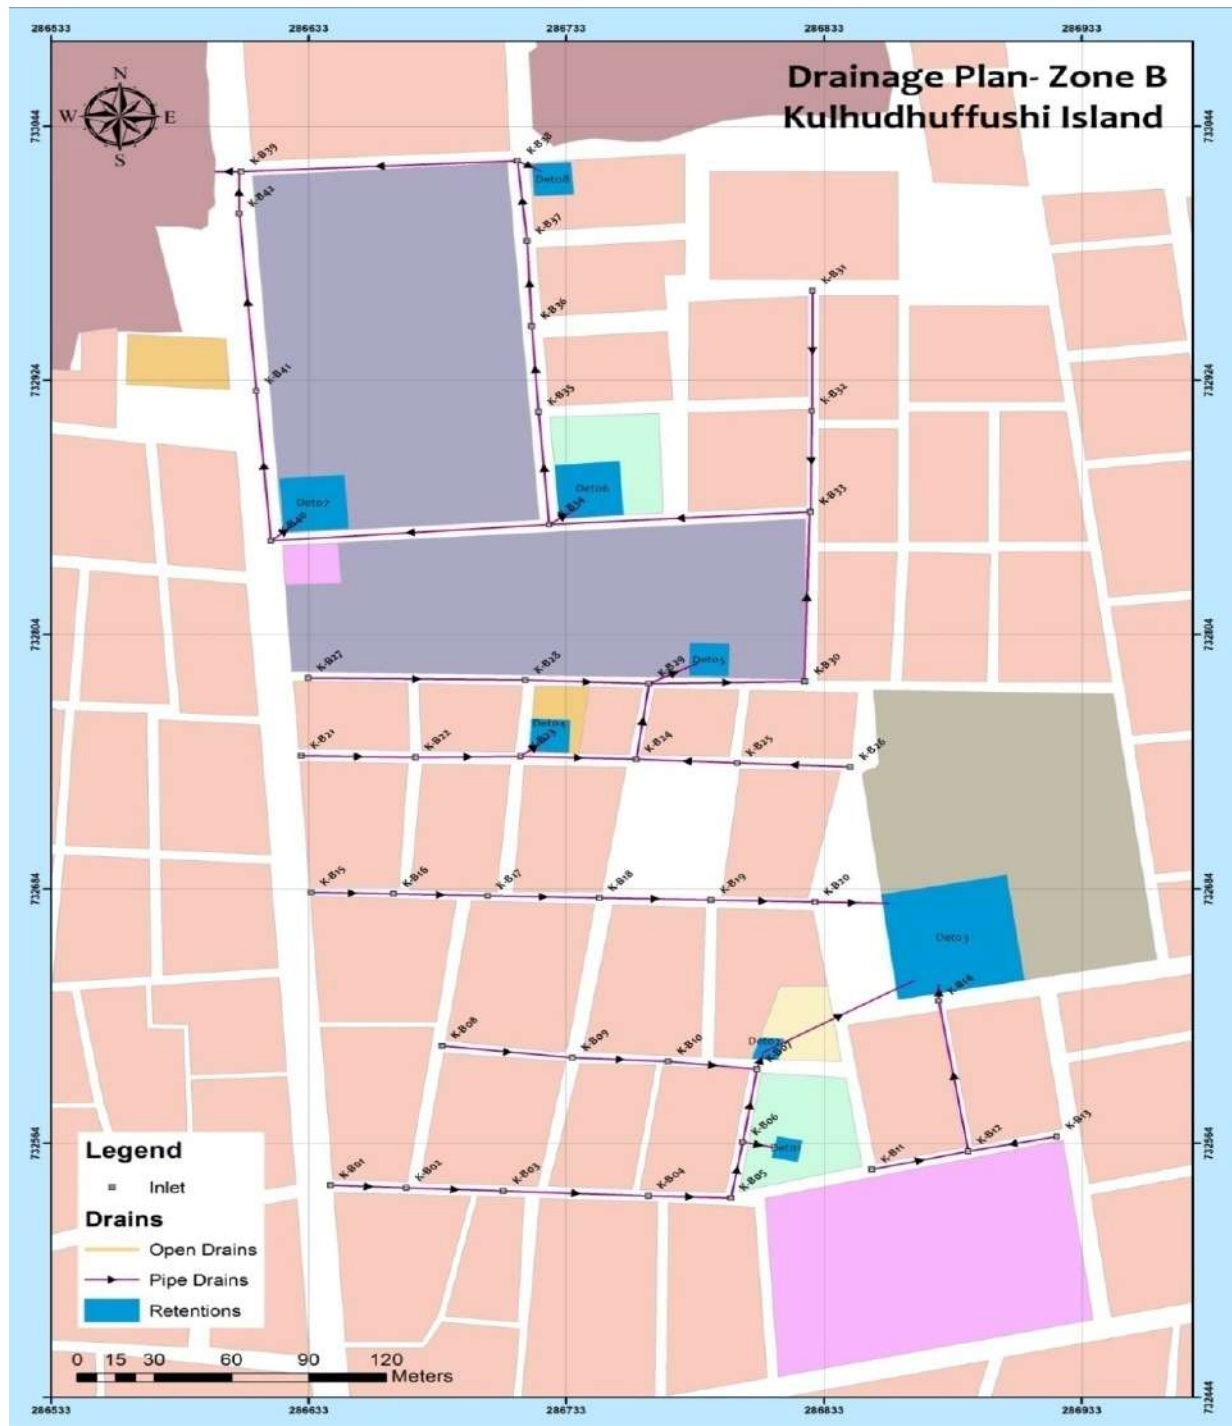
out Drainage plan Zone B Hdh. Kulhudhuffushi Island
